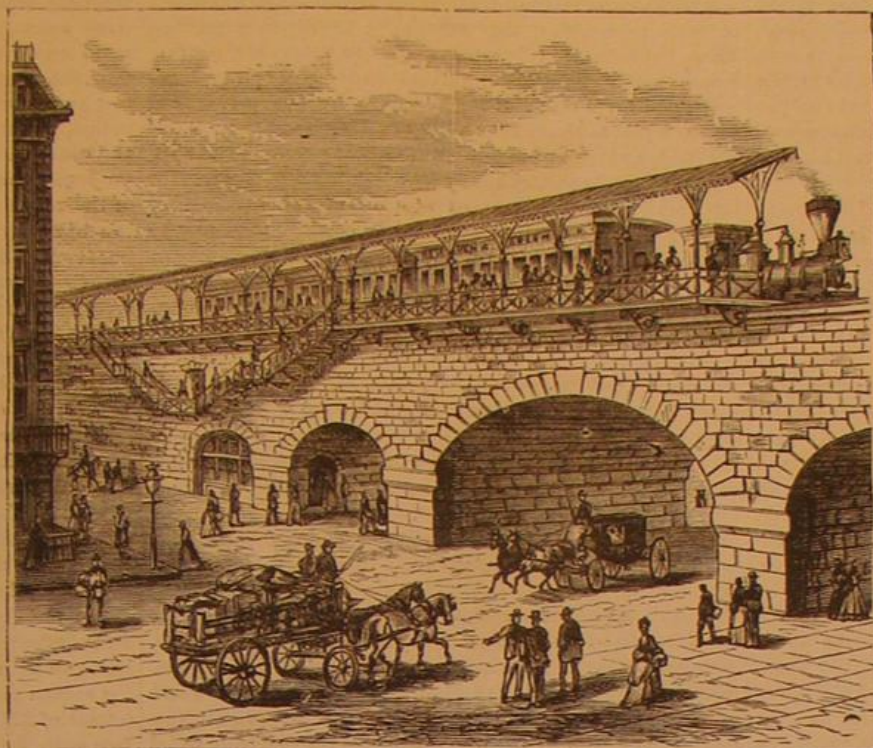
THE UNDERGROUND RAILWAY, NEW YORK CITY.—THE VIADUCT AND PASSENGER STATION AT 110th STREET.
